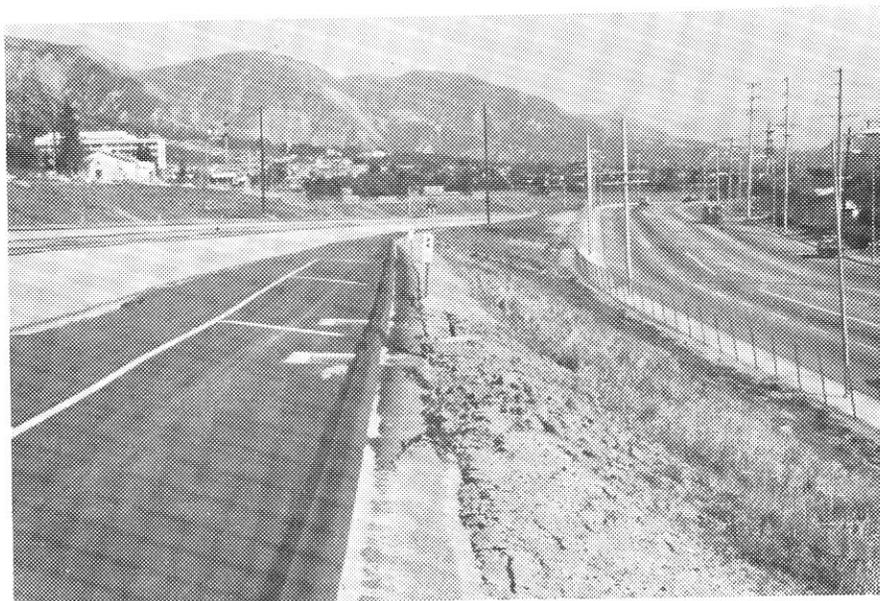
Shattering of outer portion of fill east of Roxford Street.
